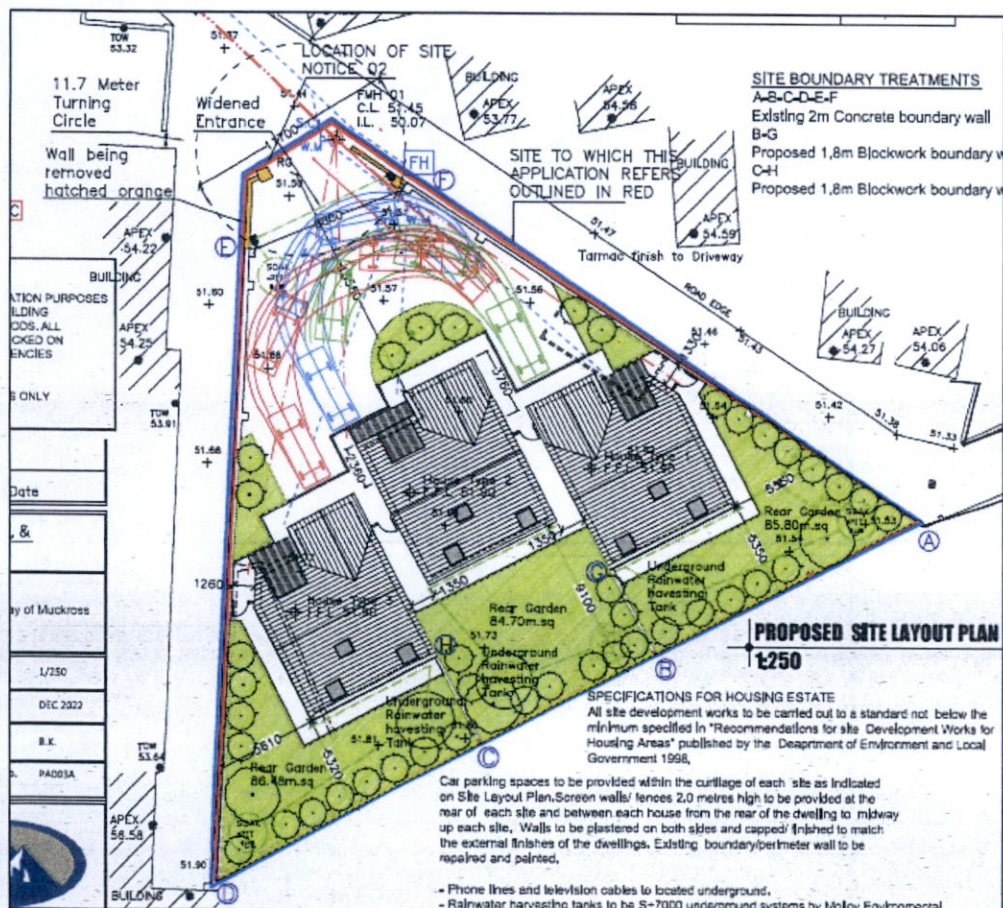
Extract of Updated Site Layout Plan Drawing No. PA003A (see Appendix II).
